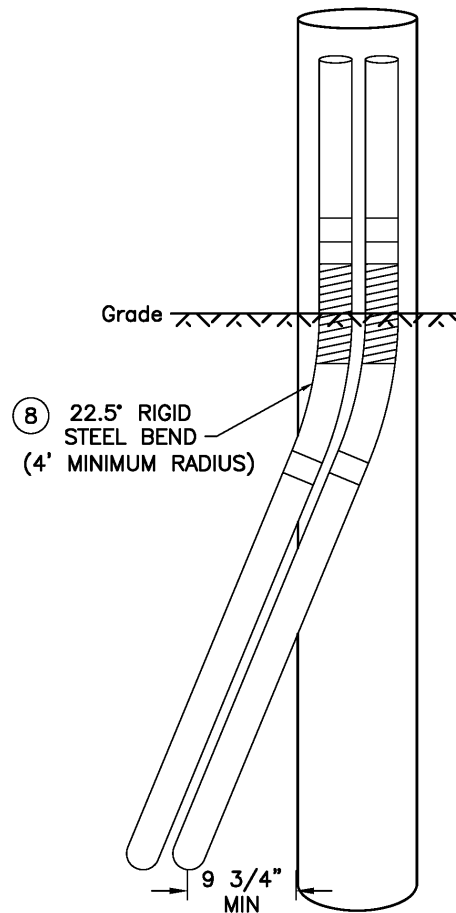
Wraparound Steel Conduit Riser, Profile View
